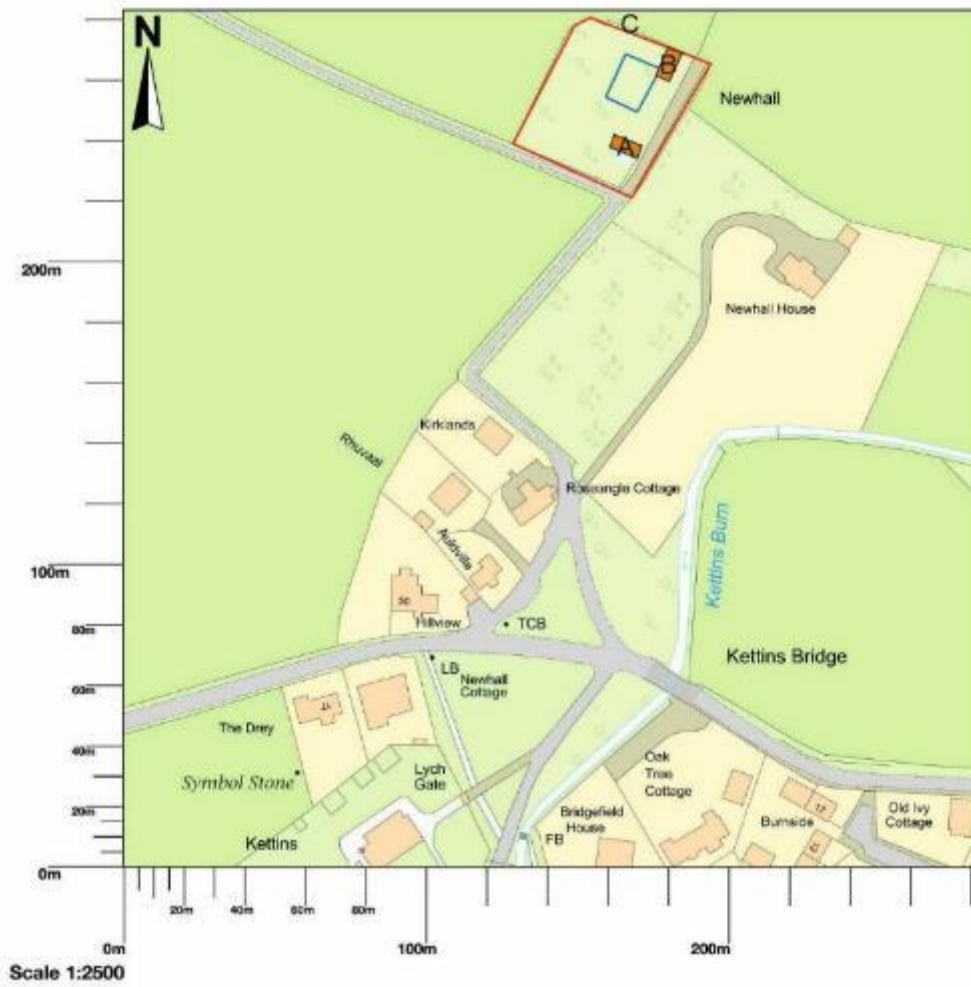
Site plan in 2022 with surveyed buildings marked as A, B and C, blue rectangle indicates proposed location of new house (based on supplied architects drawing).
